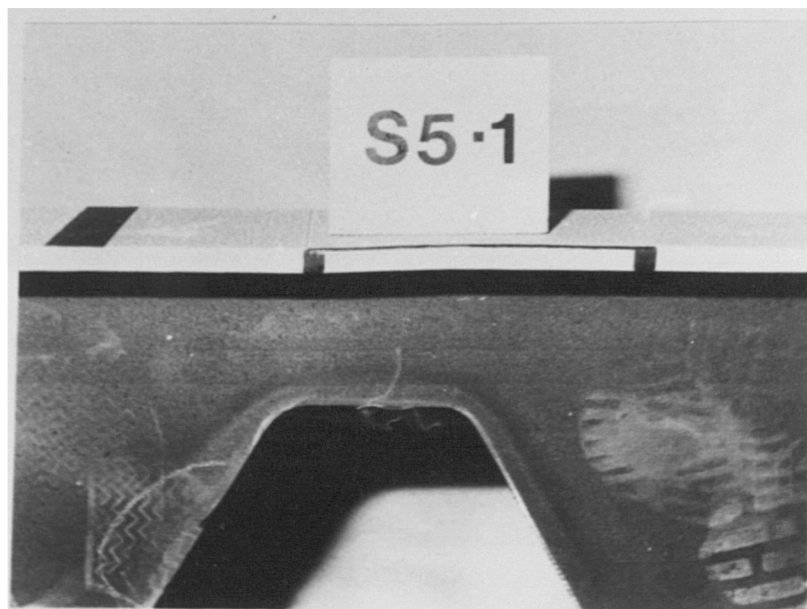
LOCAL BUCKLING FAILURE OF BEAM S5-1
